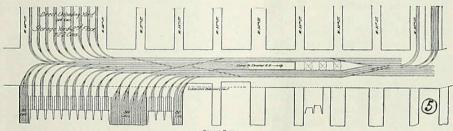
Transfer bridges, unloading and storage yards (Tomkins plan).
